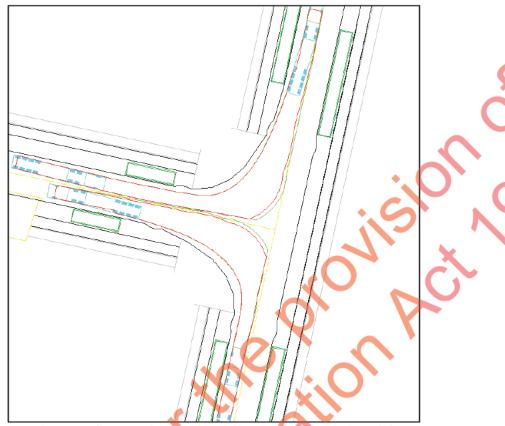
Collector Road Semi trailer Tracking Curve Plan Road 1 & Road 2)
